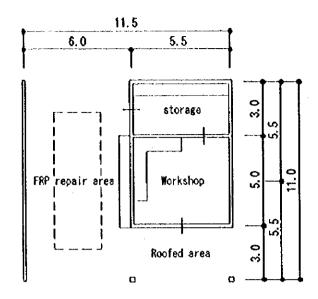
FRP Boat Maintenance Workshop Plan
